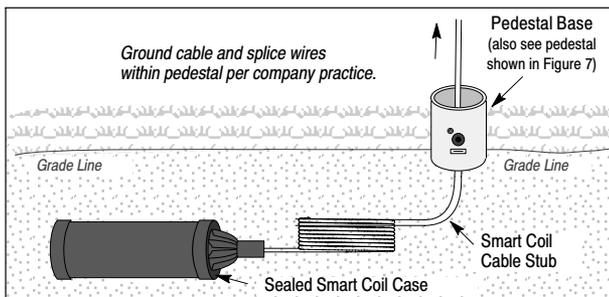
Buried Placement Example with Buried Cable and Above-Grade Pedestal
